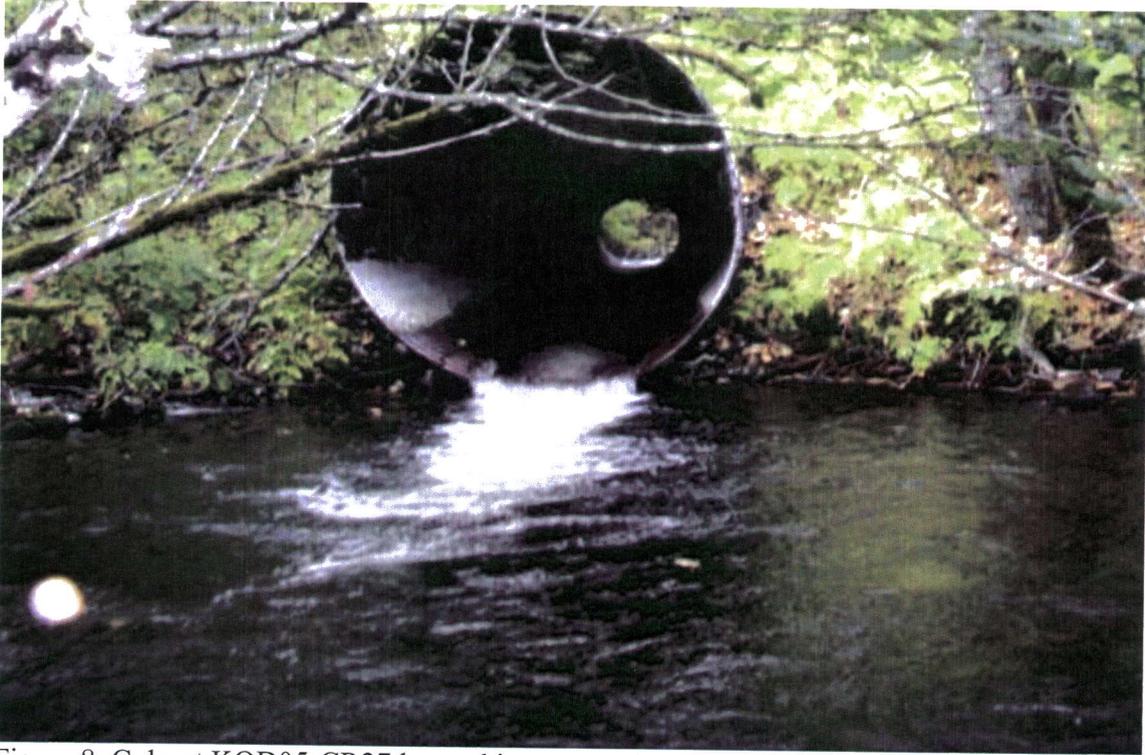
Culvert KOD05-CR27 located in unnamed stream. View looking upstream.
